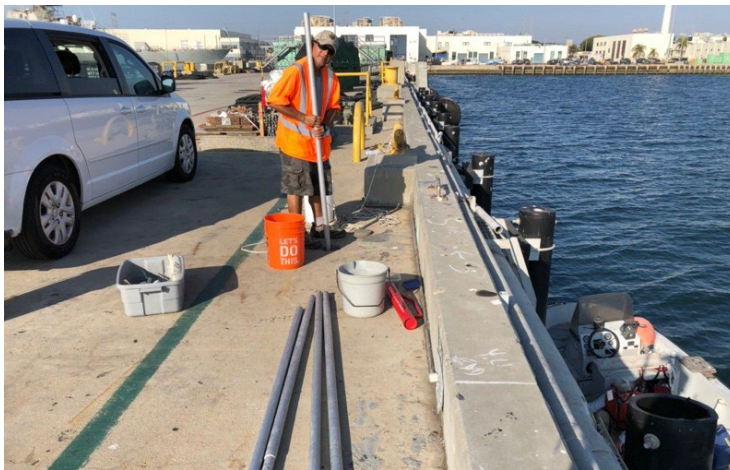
One member of the pier-surface team, with a work van that was used to transport equipment onto the pier and between stations on the pier. A support boat is also shown adjacent to the pier.
